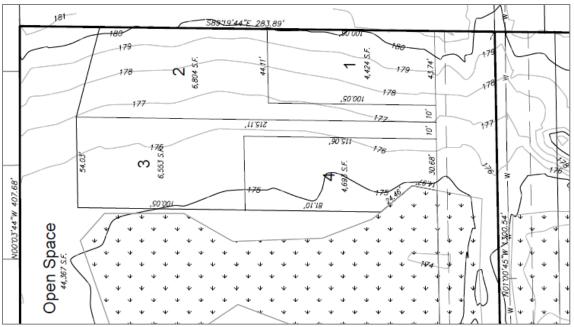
PRE 21-25 draft subdivision plan
